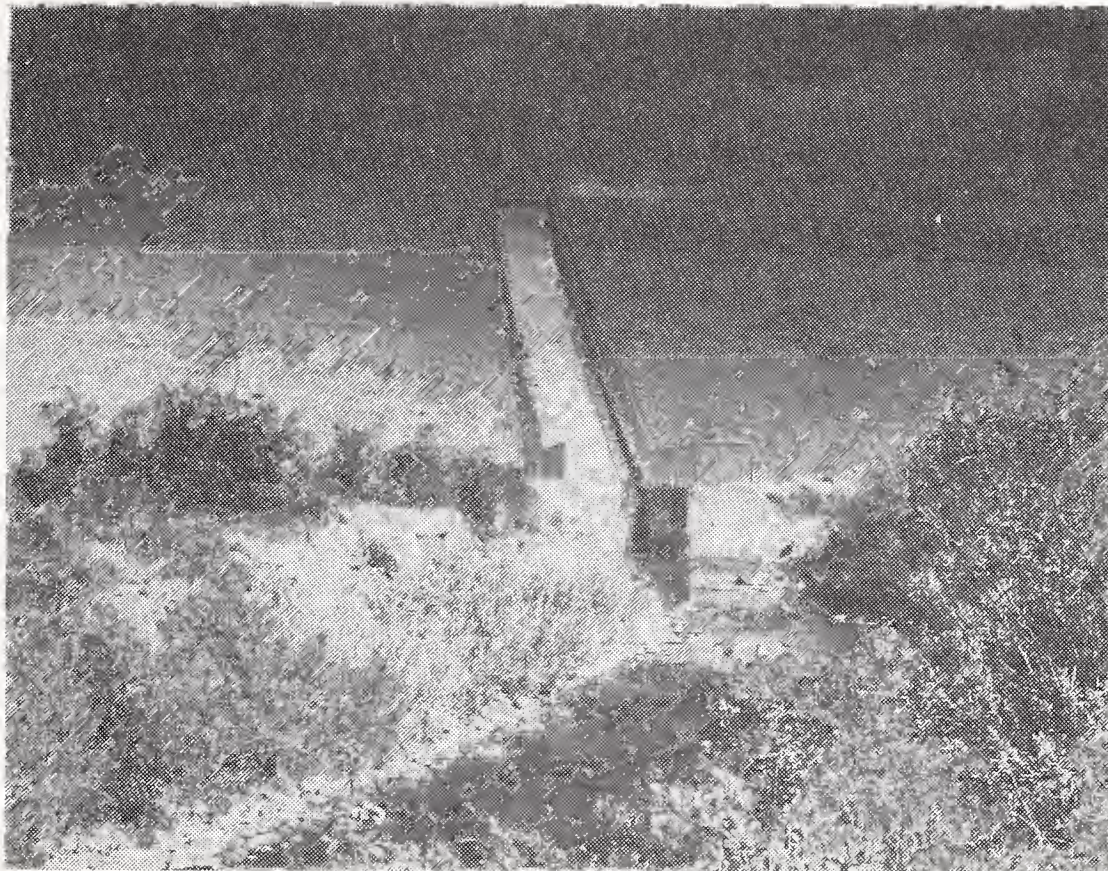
Chute spillway. Water is coming from irrigation outlet to right looking upstream.
